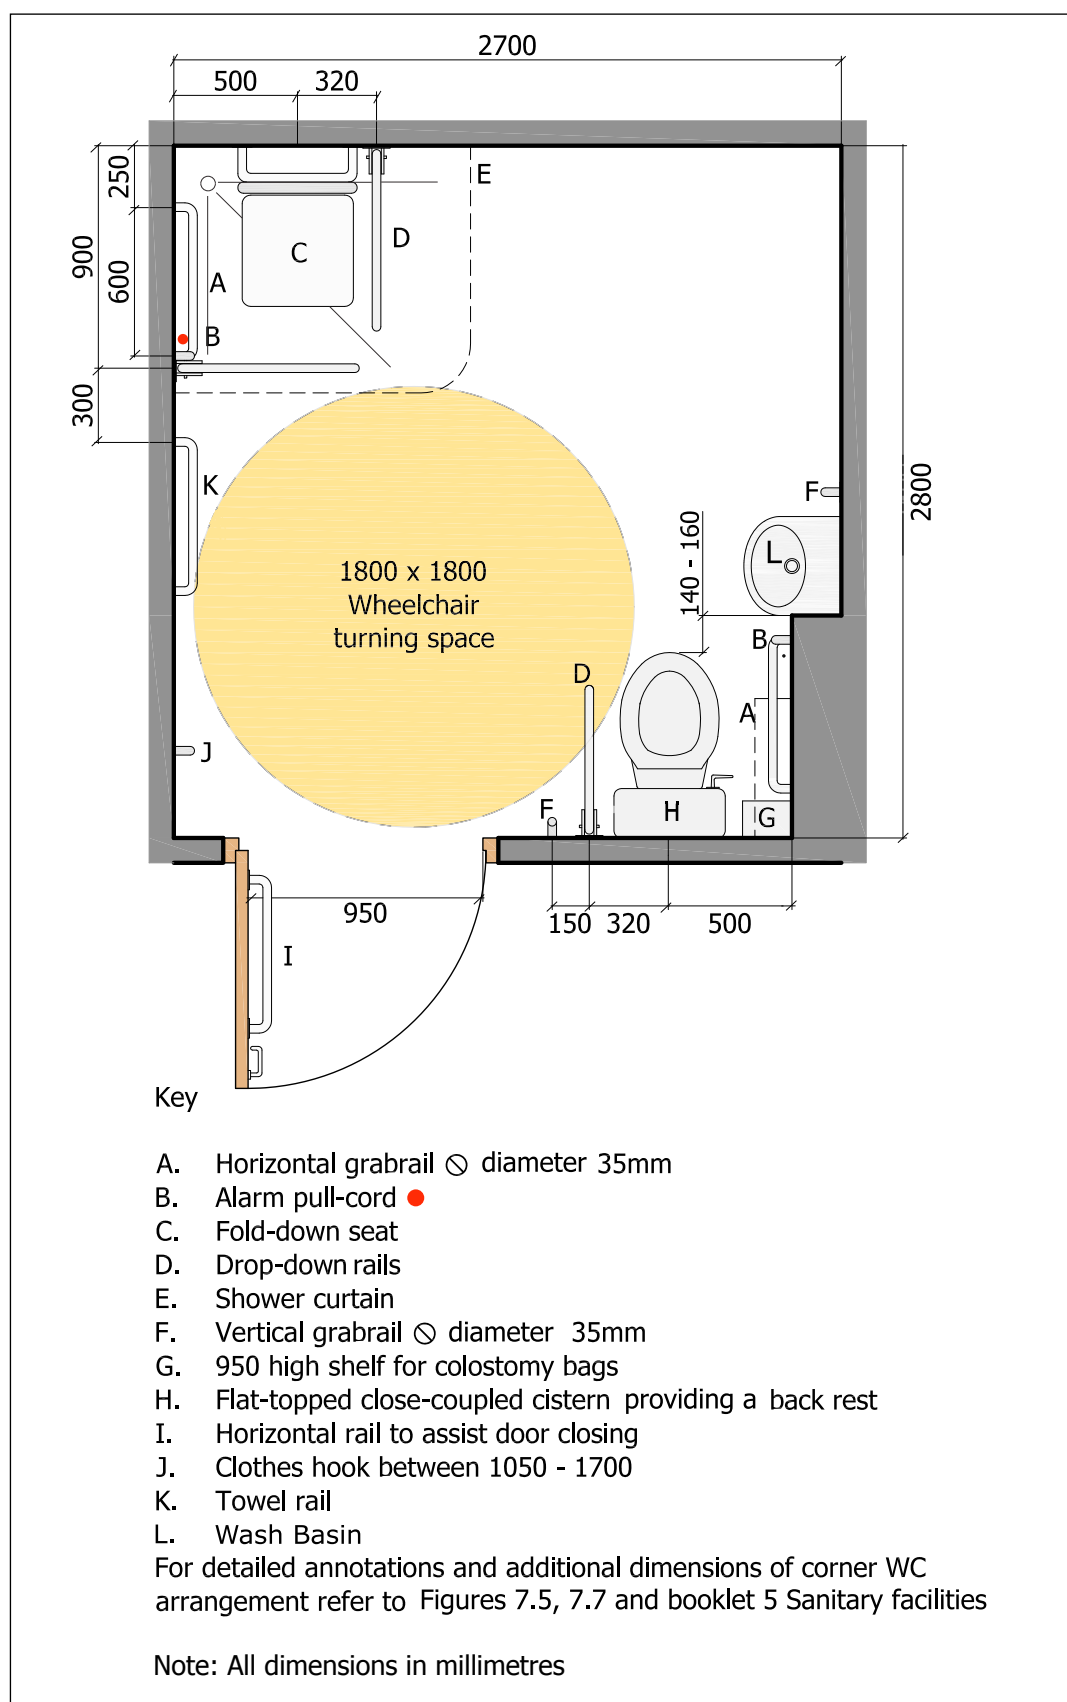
Example of an accessible shower with WC. This layout should be used when providing accessible hotel rooms.
